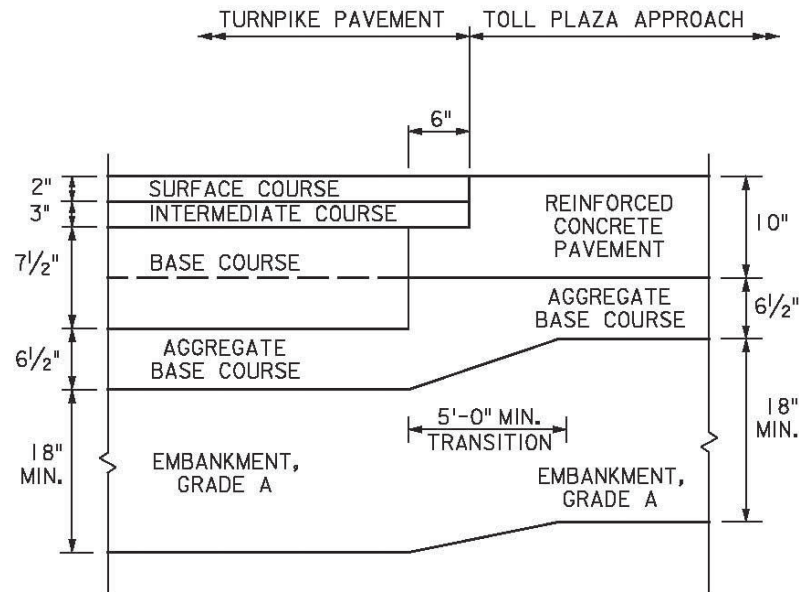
Turnpike Pavement Removal and Reconstruction Detail
